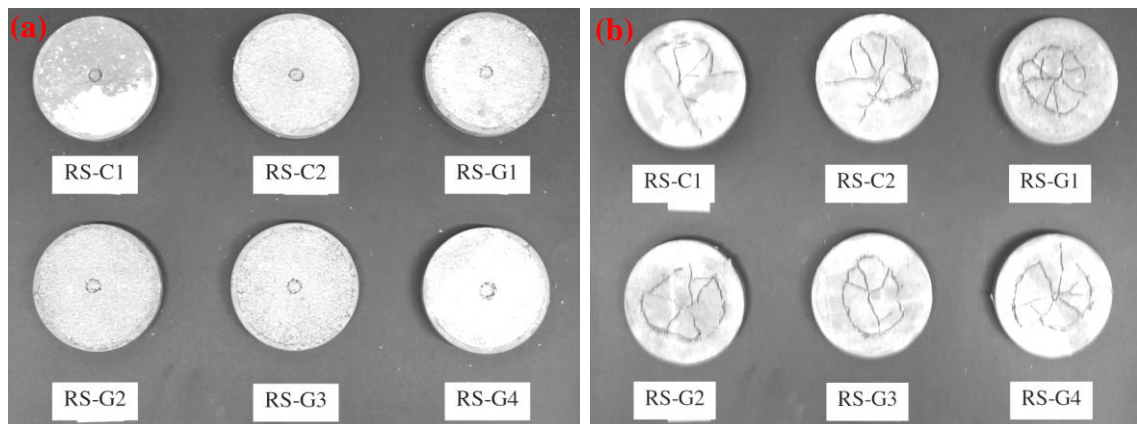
Typical cracking patterns of slabs after punching shear failure: (a) Top face and, (b) Bottom face.
